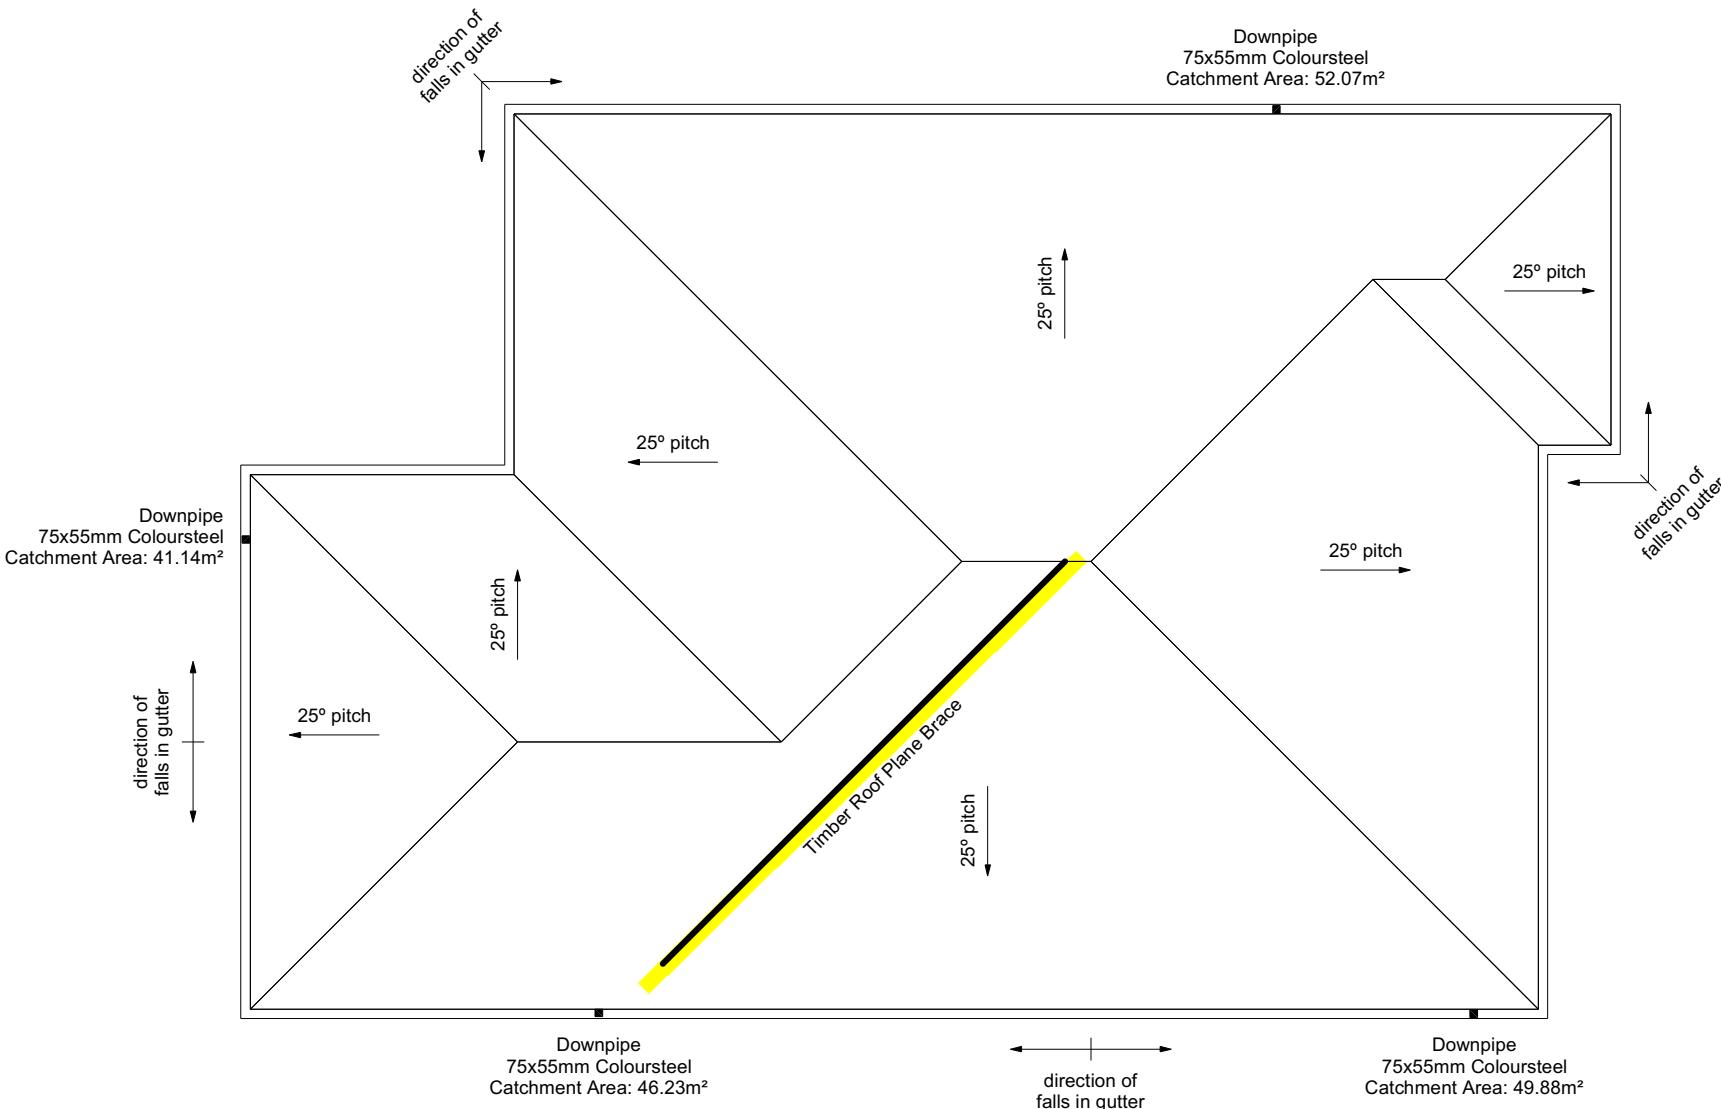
Roof plane diagonal brace – Timber (see 10.4.2)
